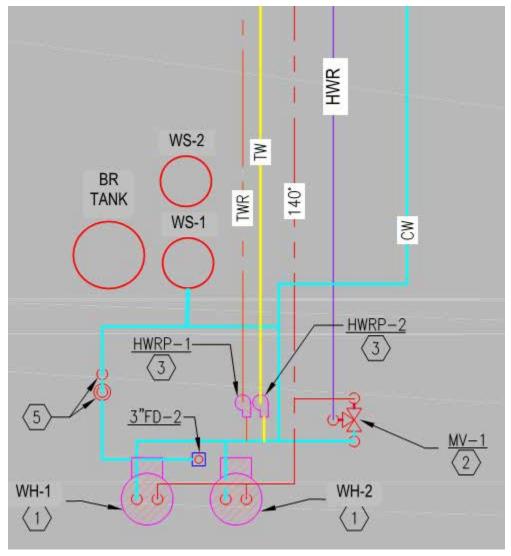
Proposed layout, Water Heaters, and Water Softener Systems
